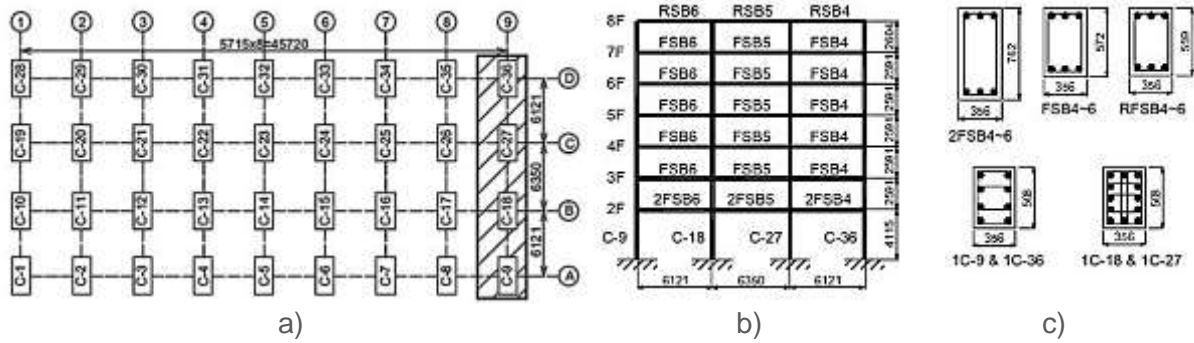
Specification of the reference building frame (without base isolation) considered in this study: a) columns plan; b) elevation; c) cross-sections of the beams and columns
